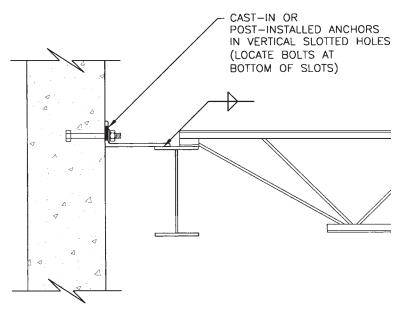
Connection between endwall frame and shear wall. Using an angle or bent plate with vertical slotted holes allows the frame to deflect without jeopardizing shear transfer to the wall.
